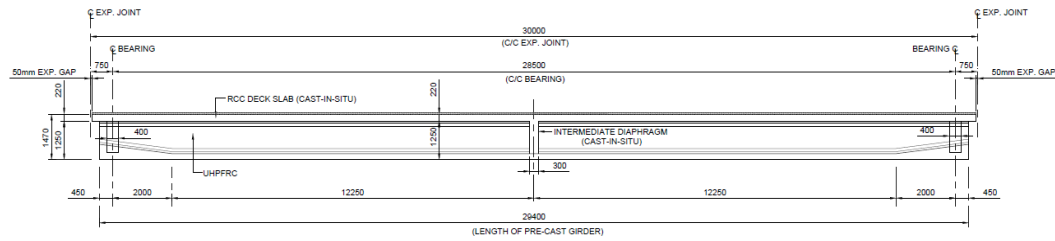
25 Elevation of 30m span UHPFRC post tensioned I girder
